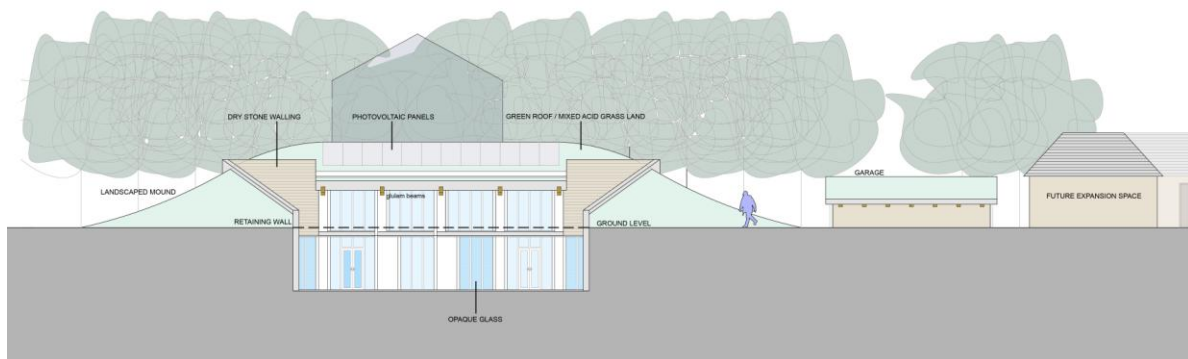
Rear elevation of the dwelling showing the garage and the potential future stables that could make up part of the Equestrian Centre (separate application).
